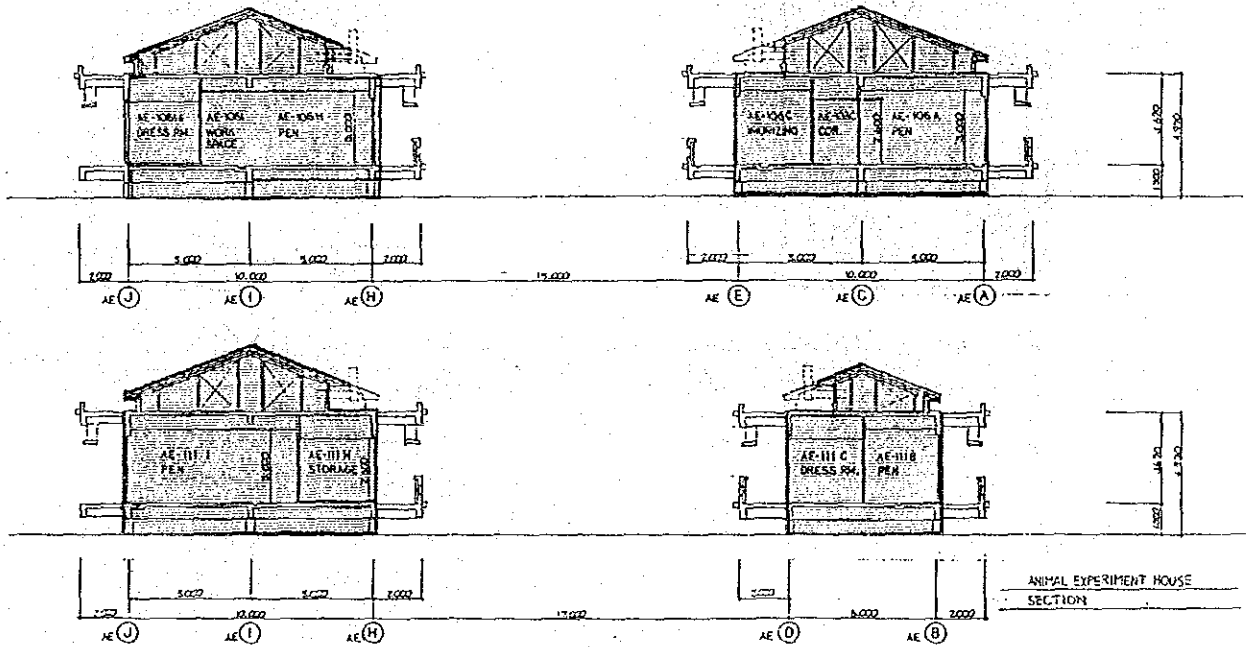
SECTION OF ANIMAL EXPERIMENT BUILDING
